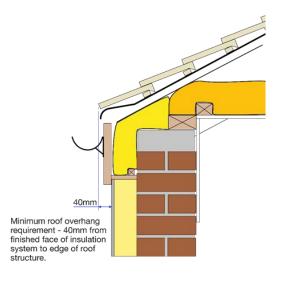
Minimum overhang from roof structure to the finished face of EWI system
